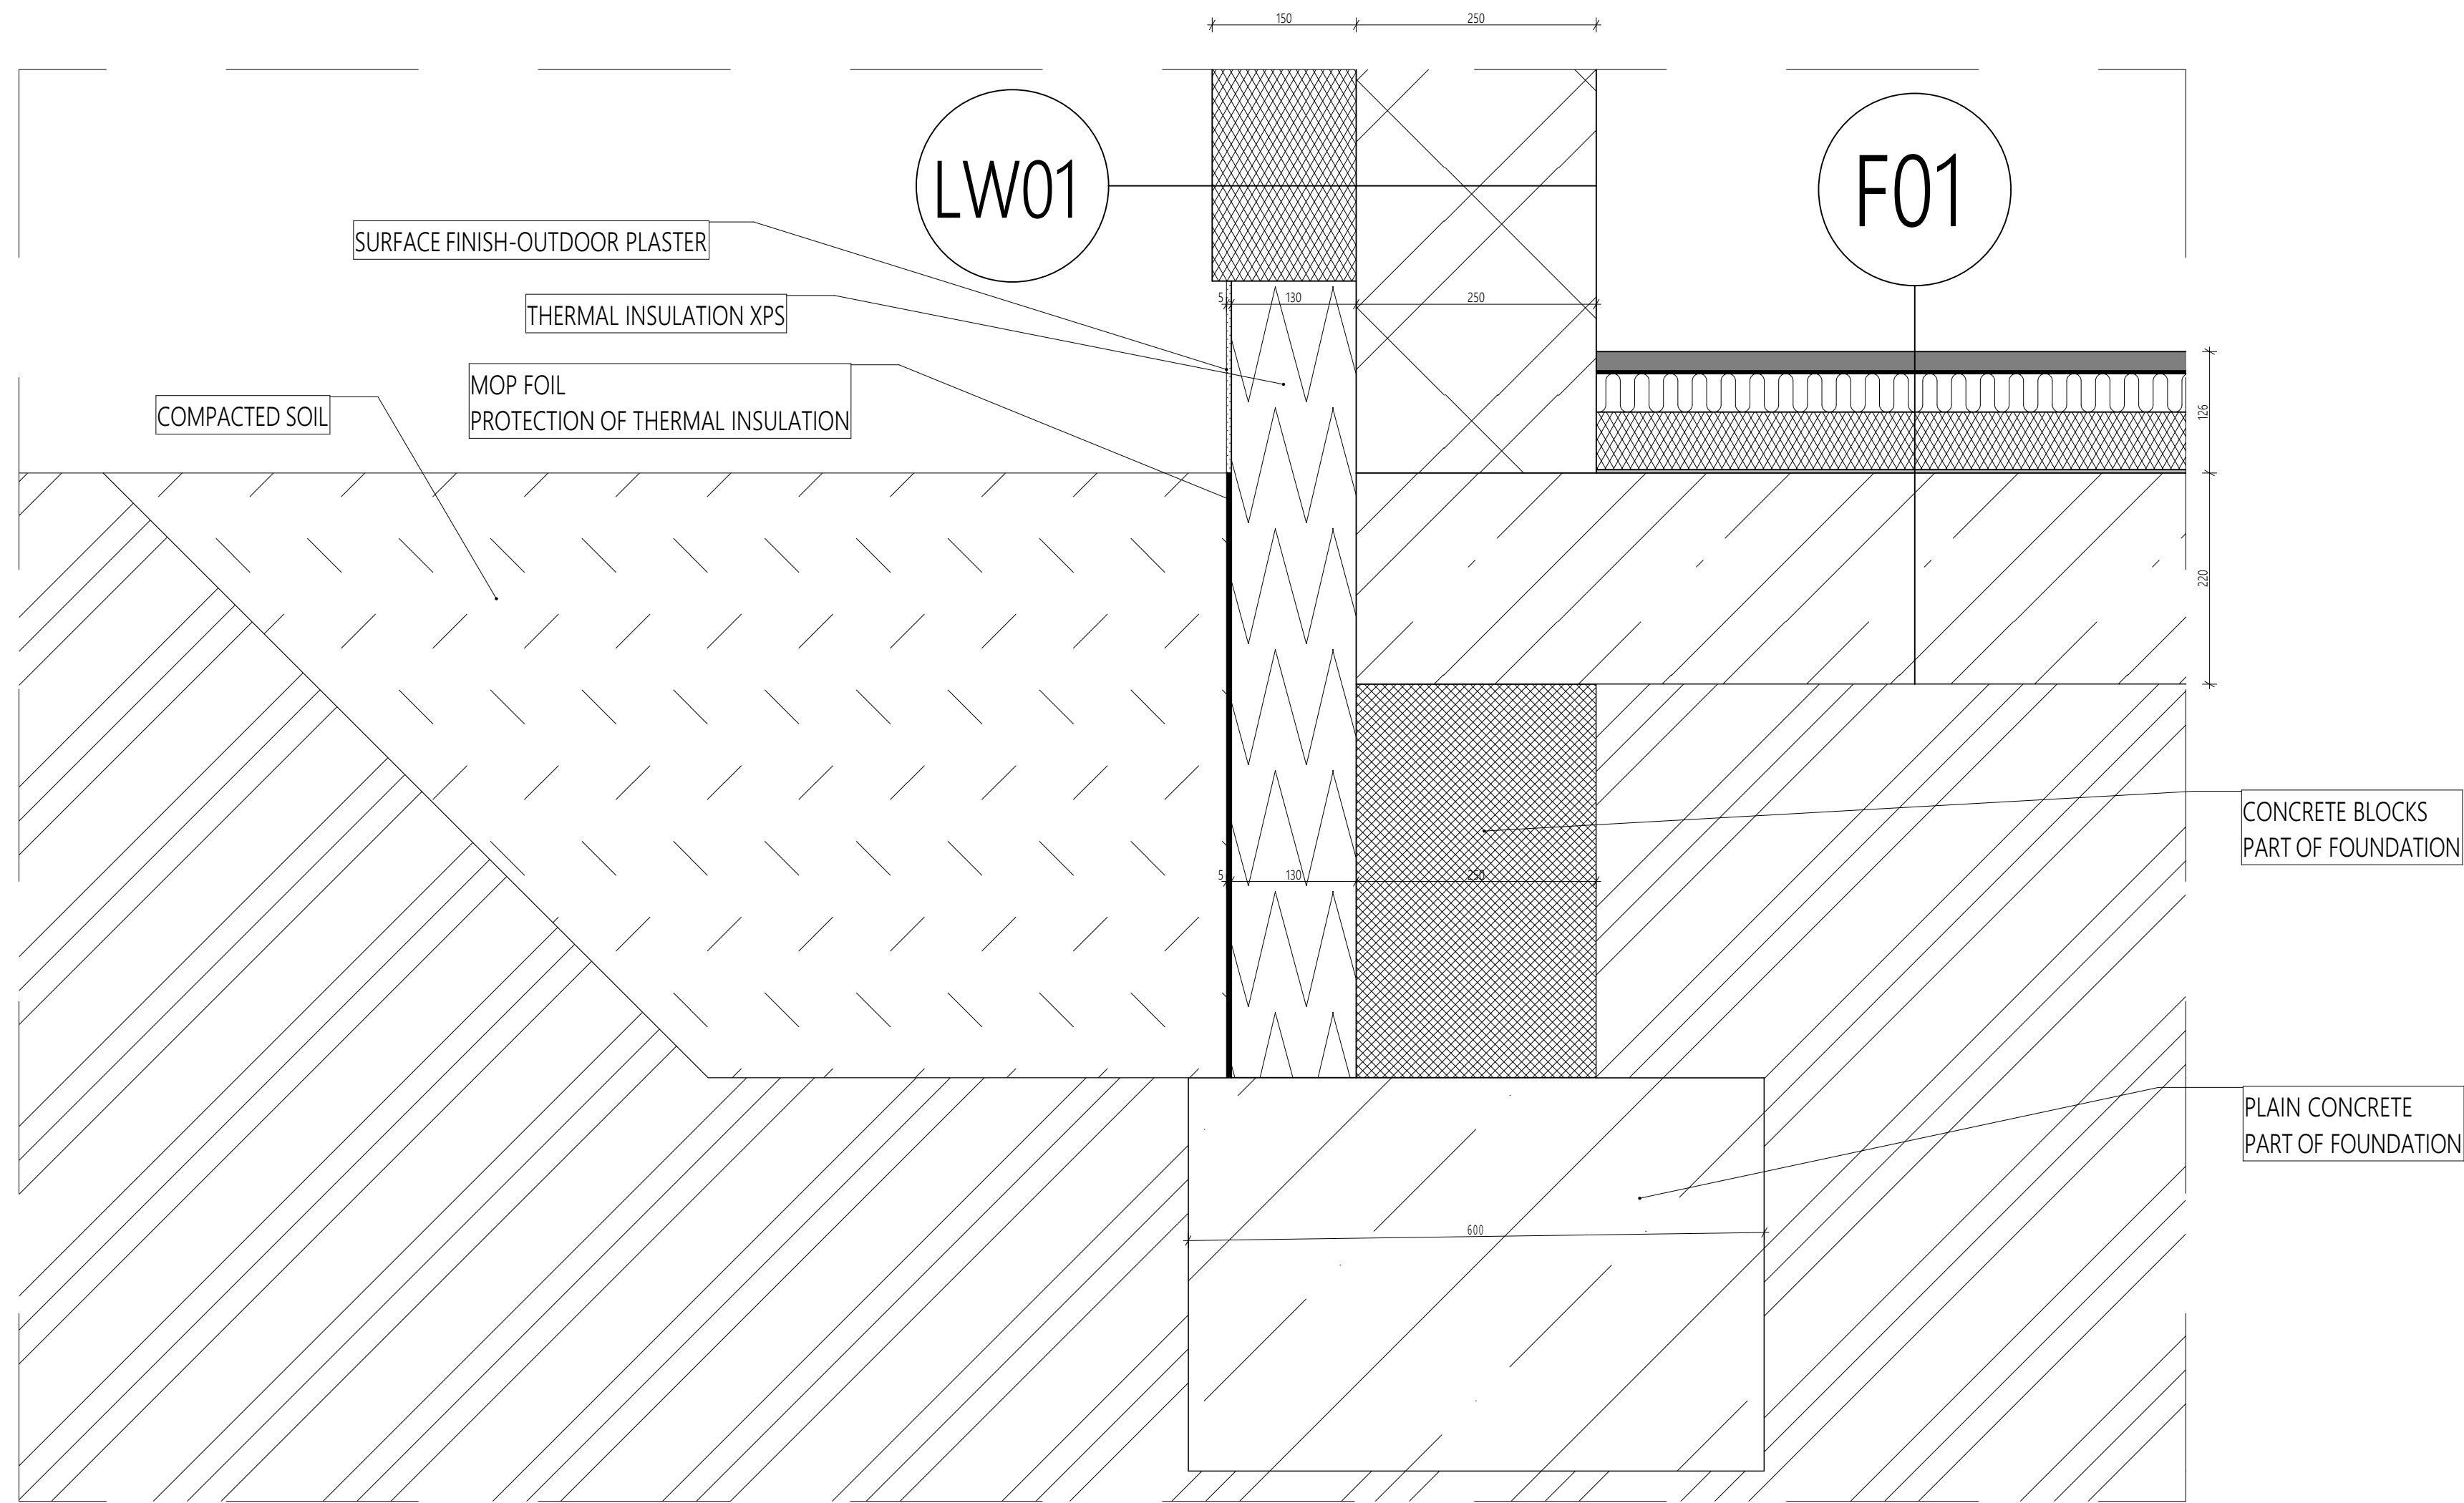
DETAIL A - DETAIL OF SOCLE WITH FOUNDATION
